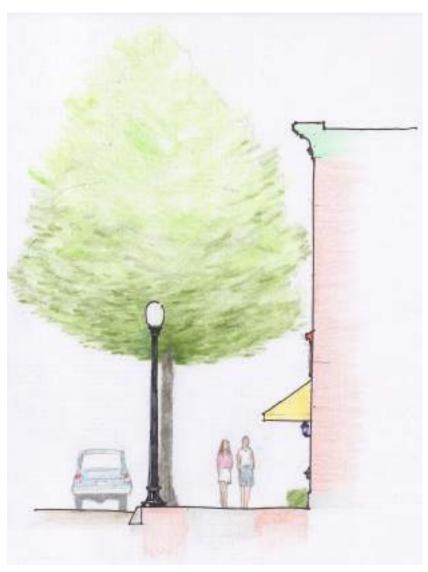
Ideal sidewalk design in downtown business districts. Note the dedicated area for landscaping/furniture, walkway, and display zone.
